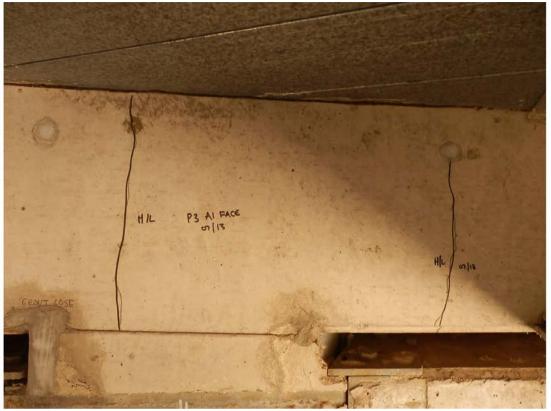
Pier 3 abutment 1 face. Hairline cracking. (Taken: 31-Jul-2013)
